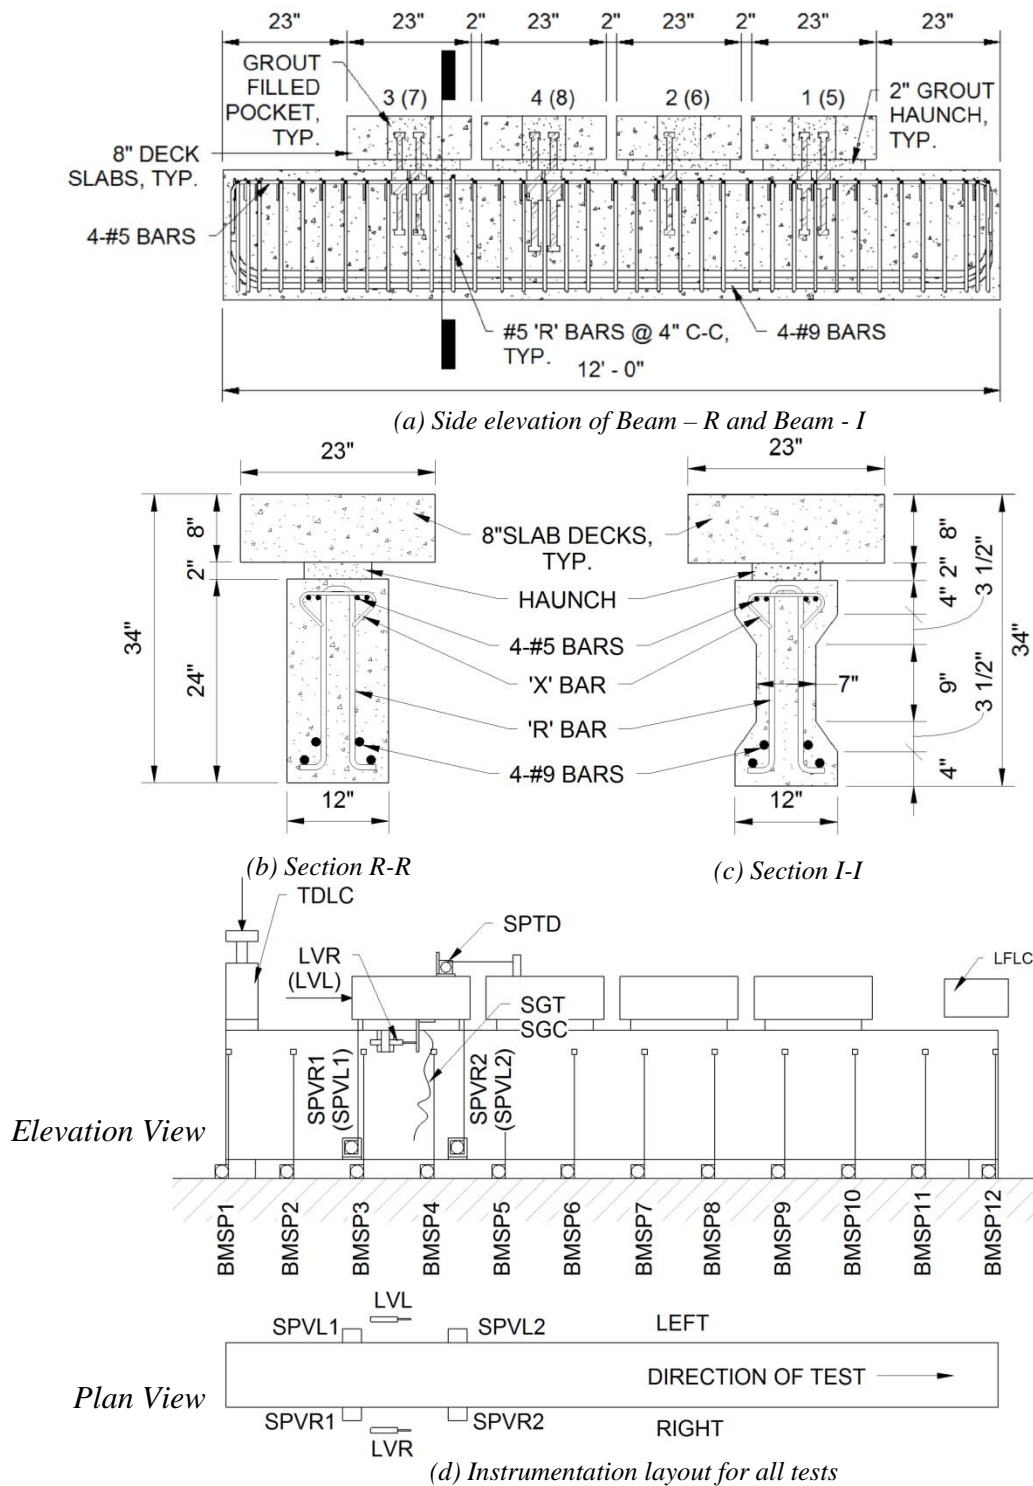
Details of experimental specimens. The number given above the slab portions indicate specimen number. Specimens 1 to 4 used section R-R, while Specimens (5) to (8) used section I-I. (1-in. = 25.4 mm).
